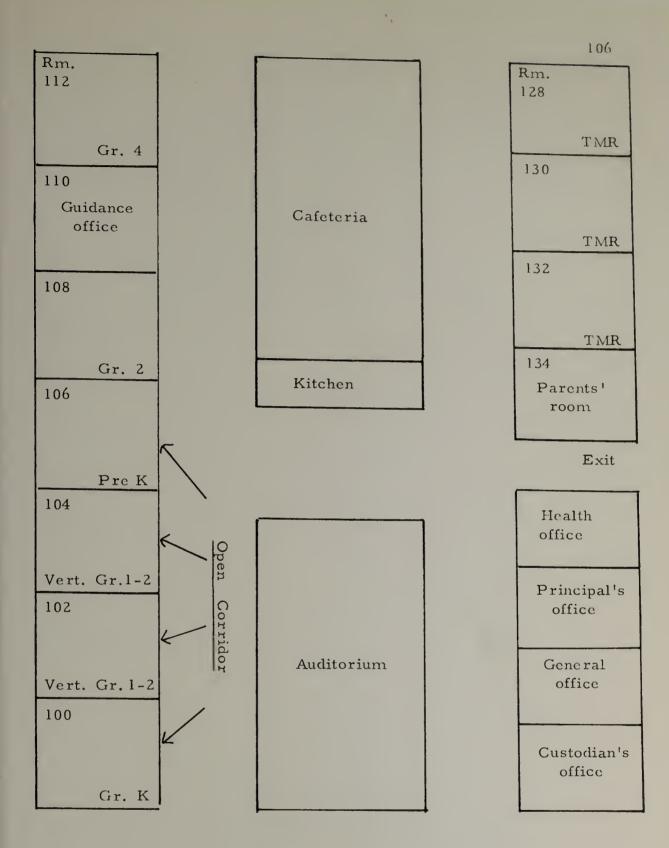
Location of Open Corridor Classrooms on First Floor of New York City Public School A
